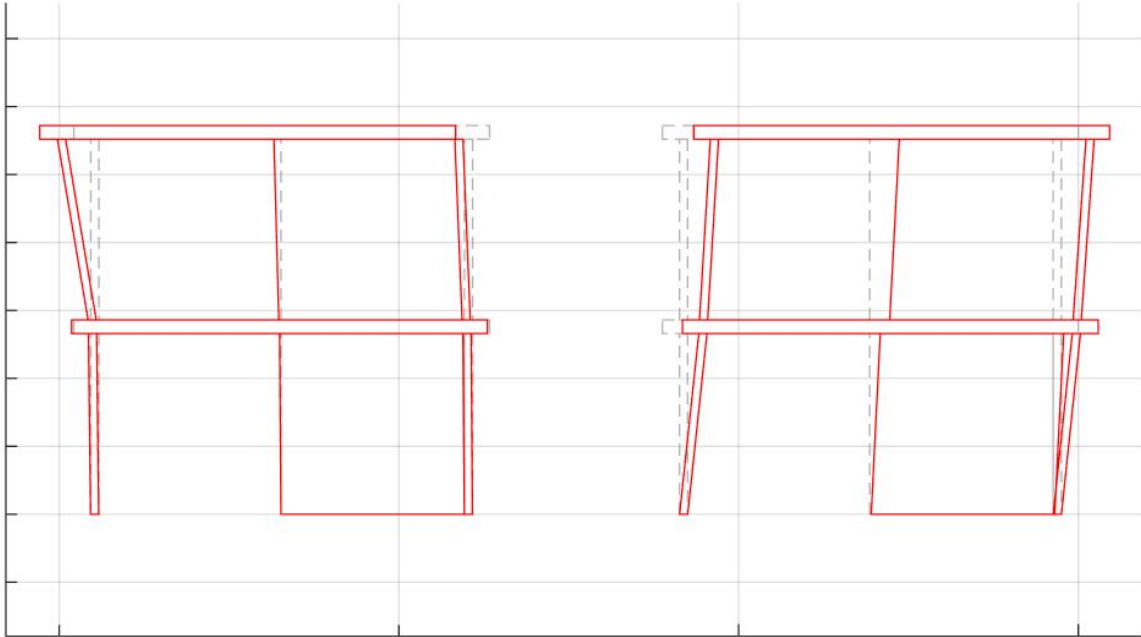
Deformed shape of EUC-BUILD4 specimen (max and min) – Test run #3.
